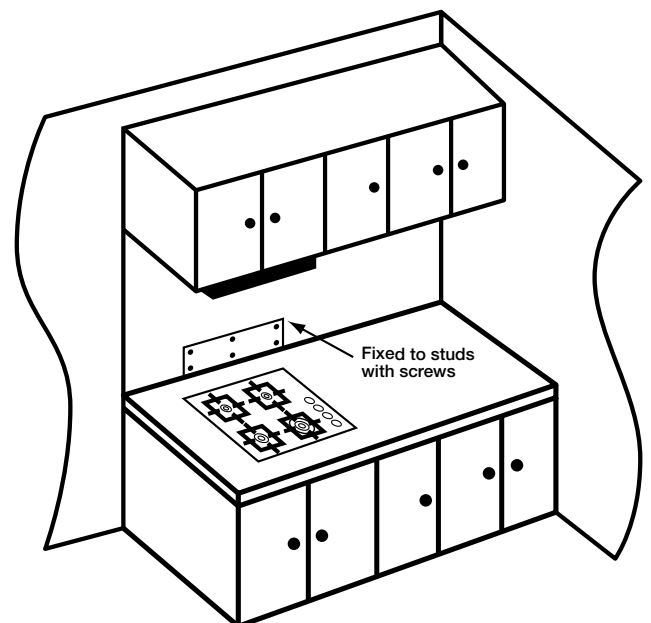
Installation of mineral board onto stud wall with self-tapping screws into the studs
